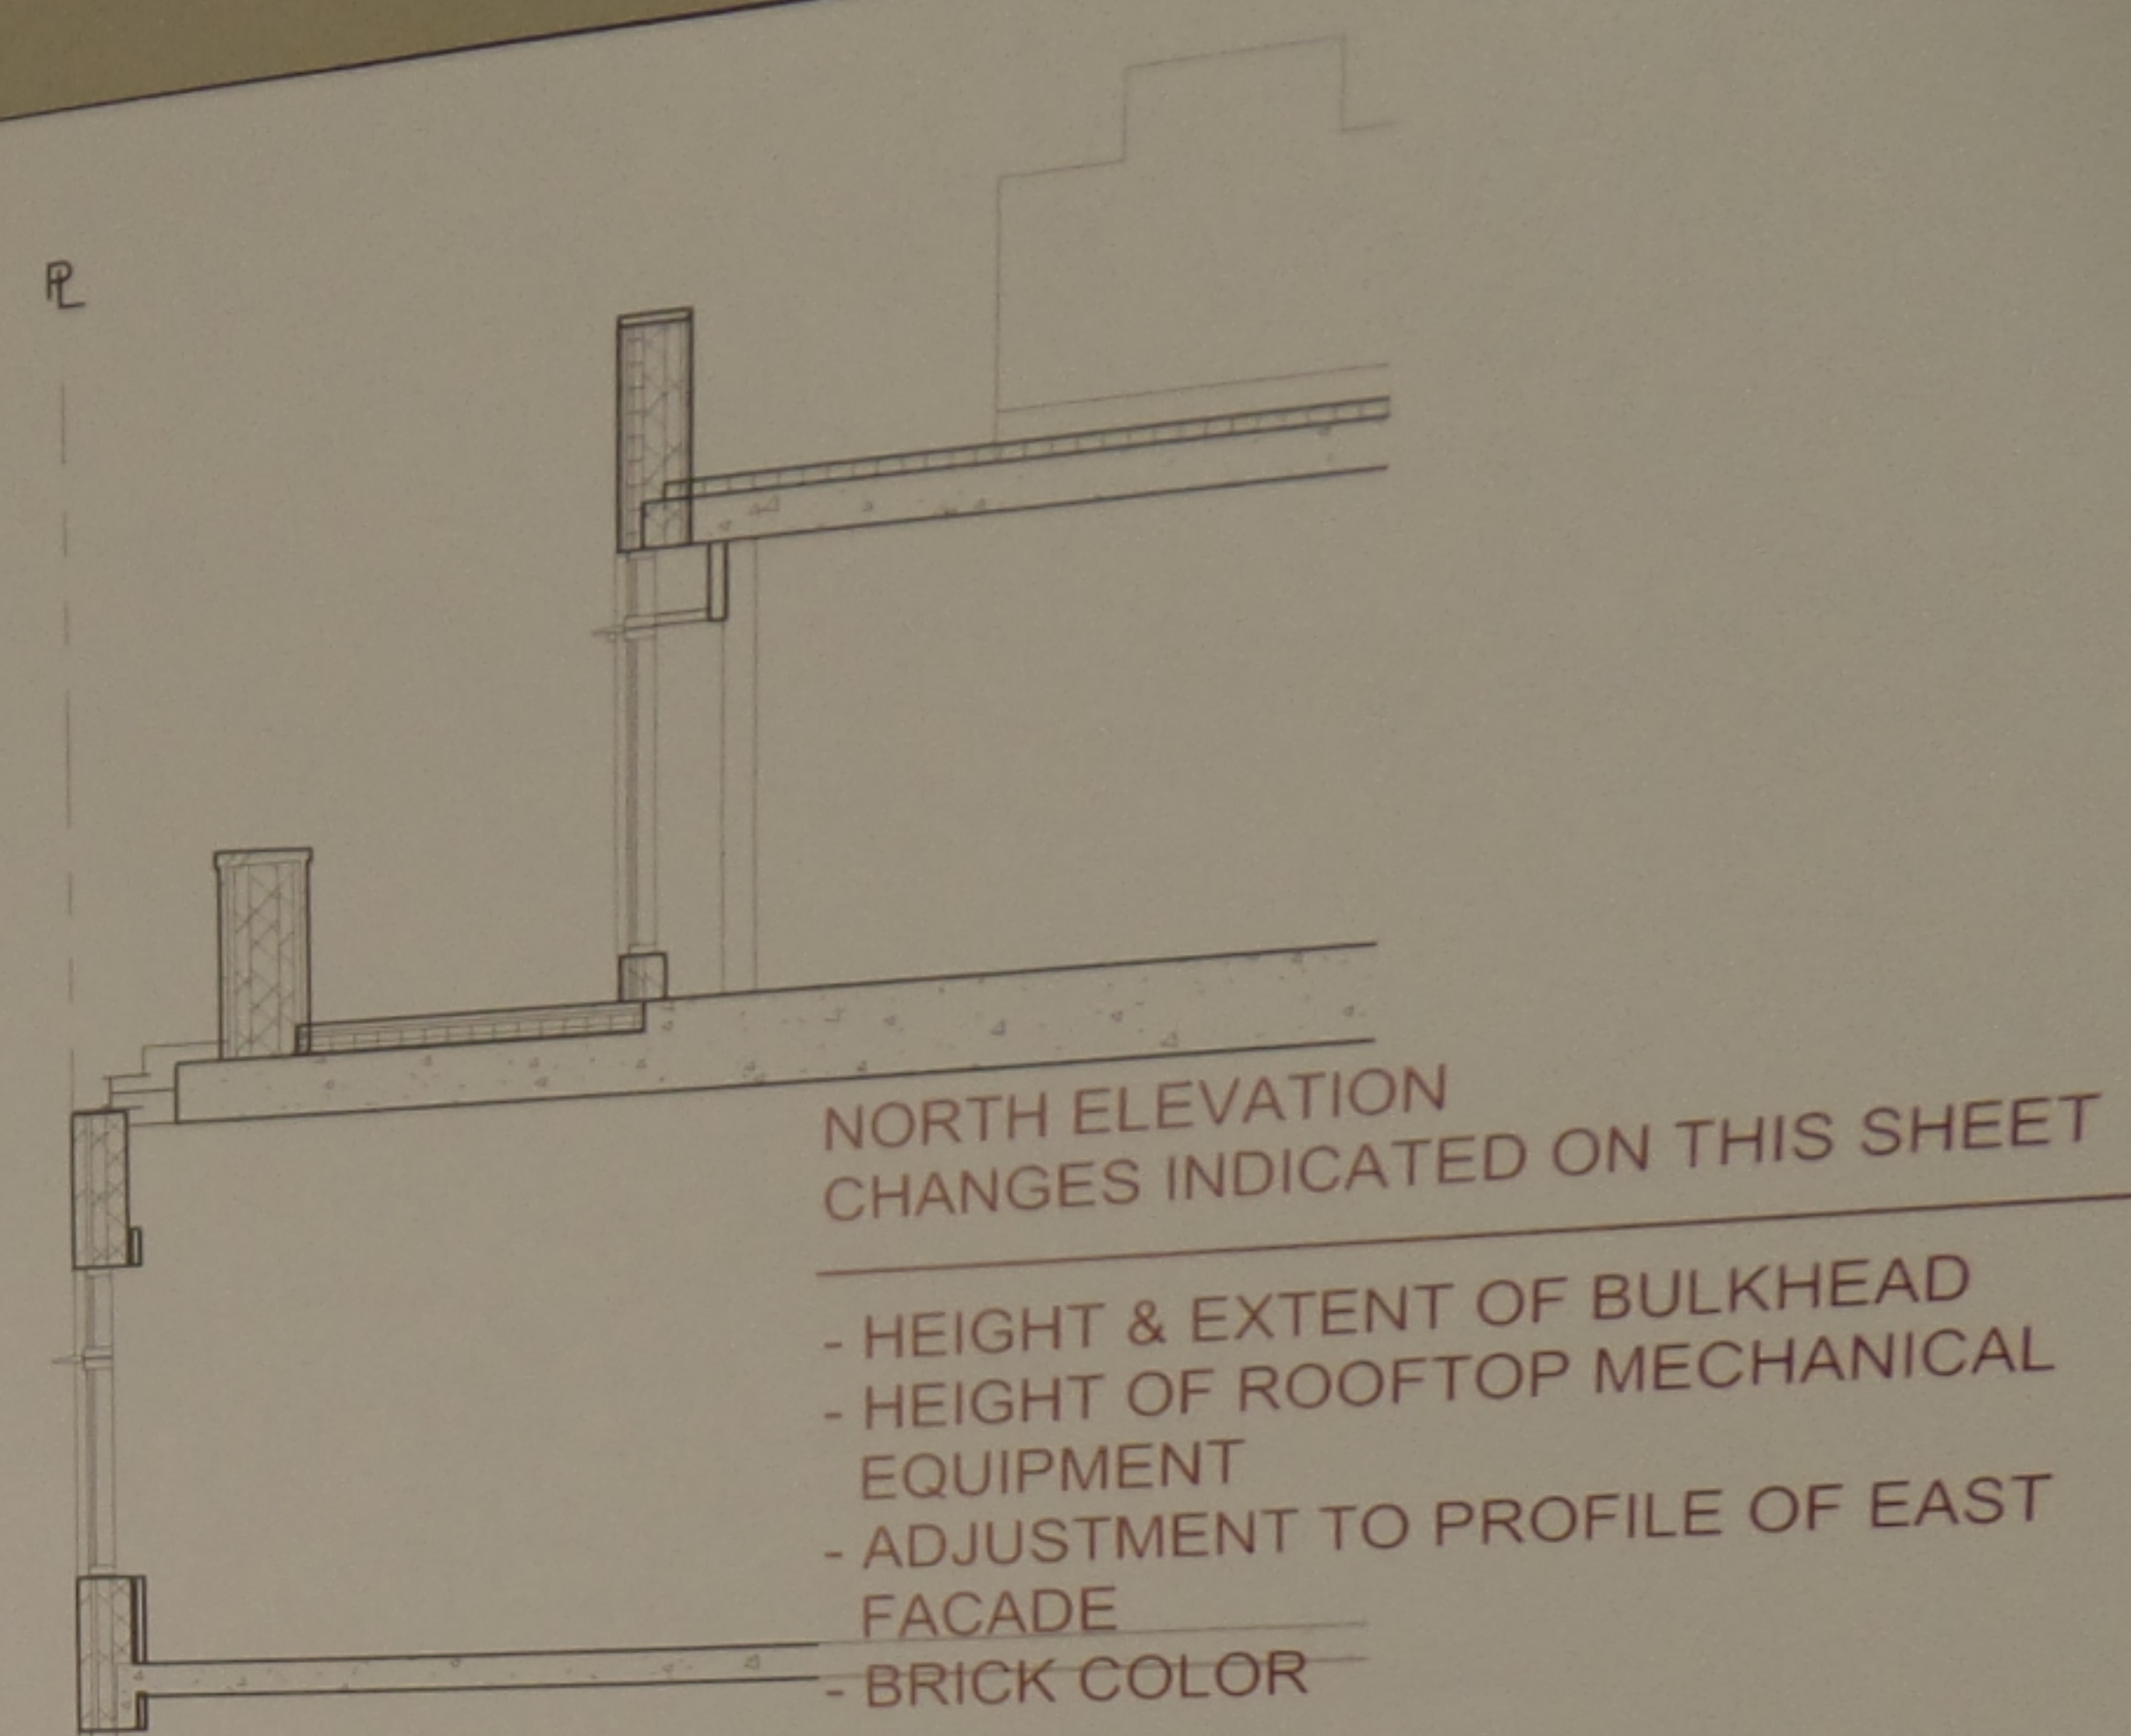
DETAIL PLAN/ SECTION/ ELEVATION AT TOP
